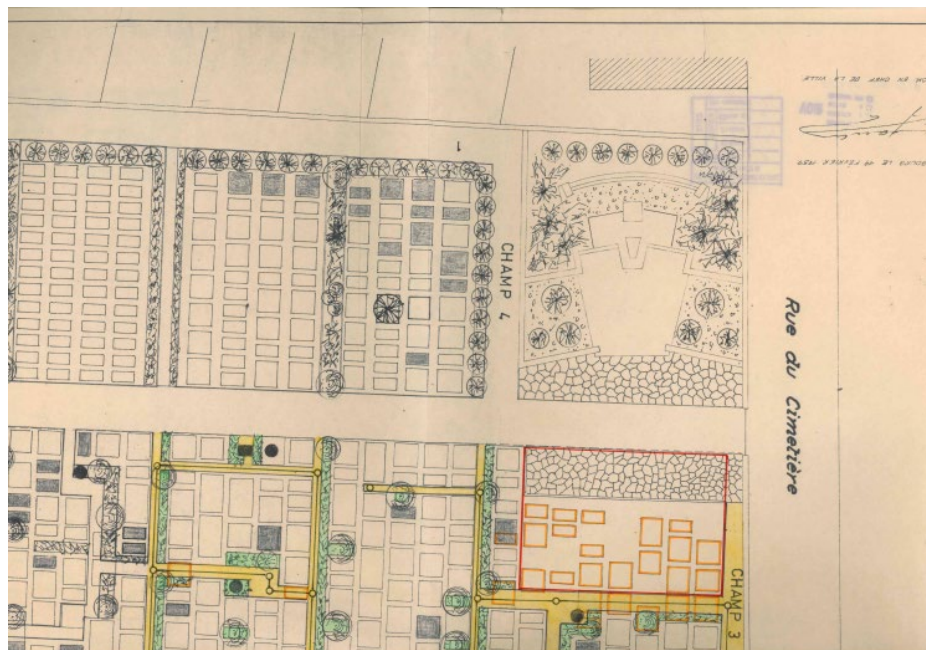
Situation plan of the cemetery showing where the hall will be built (in red)
